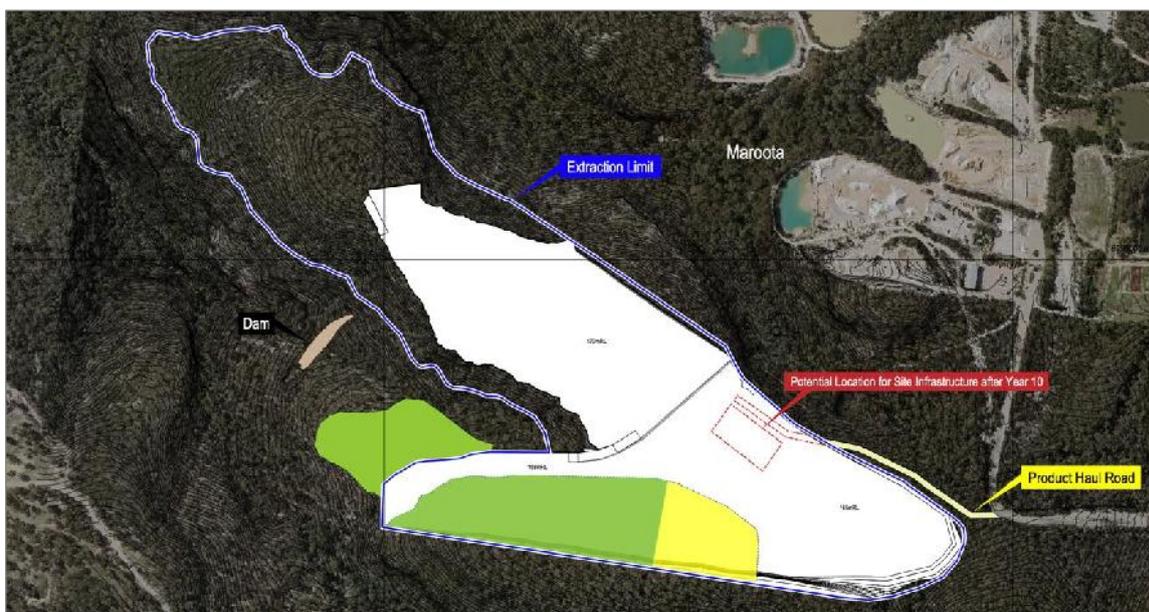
Extraction Sequence Plan Stage 3 (Source: RPM Global, 2021)
